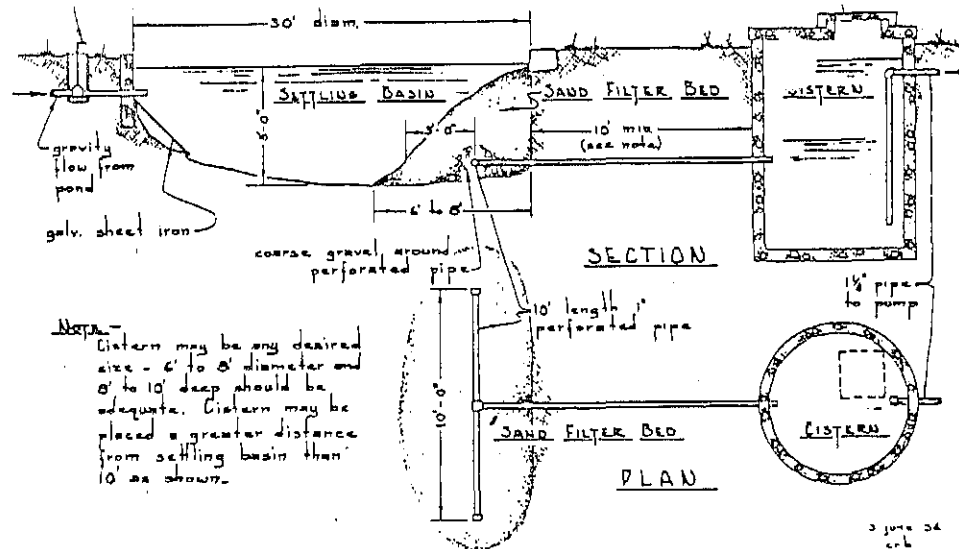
Small Earth Pond Used as Settling Basin and Filter Bed, with Nearby Cistern for Storage. Ground Plan Layout is Shown in Fig. 4.
